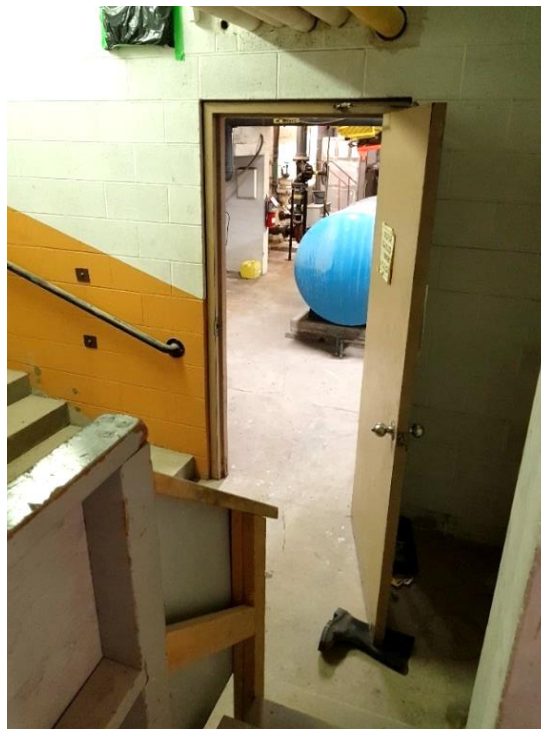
Stairs (1974/75) from opening at the north end of the corridor to subsequent rooms, looking north east.
